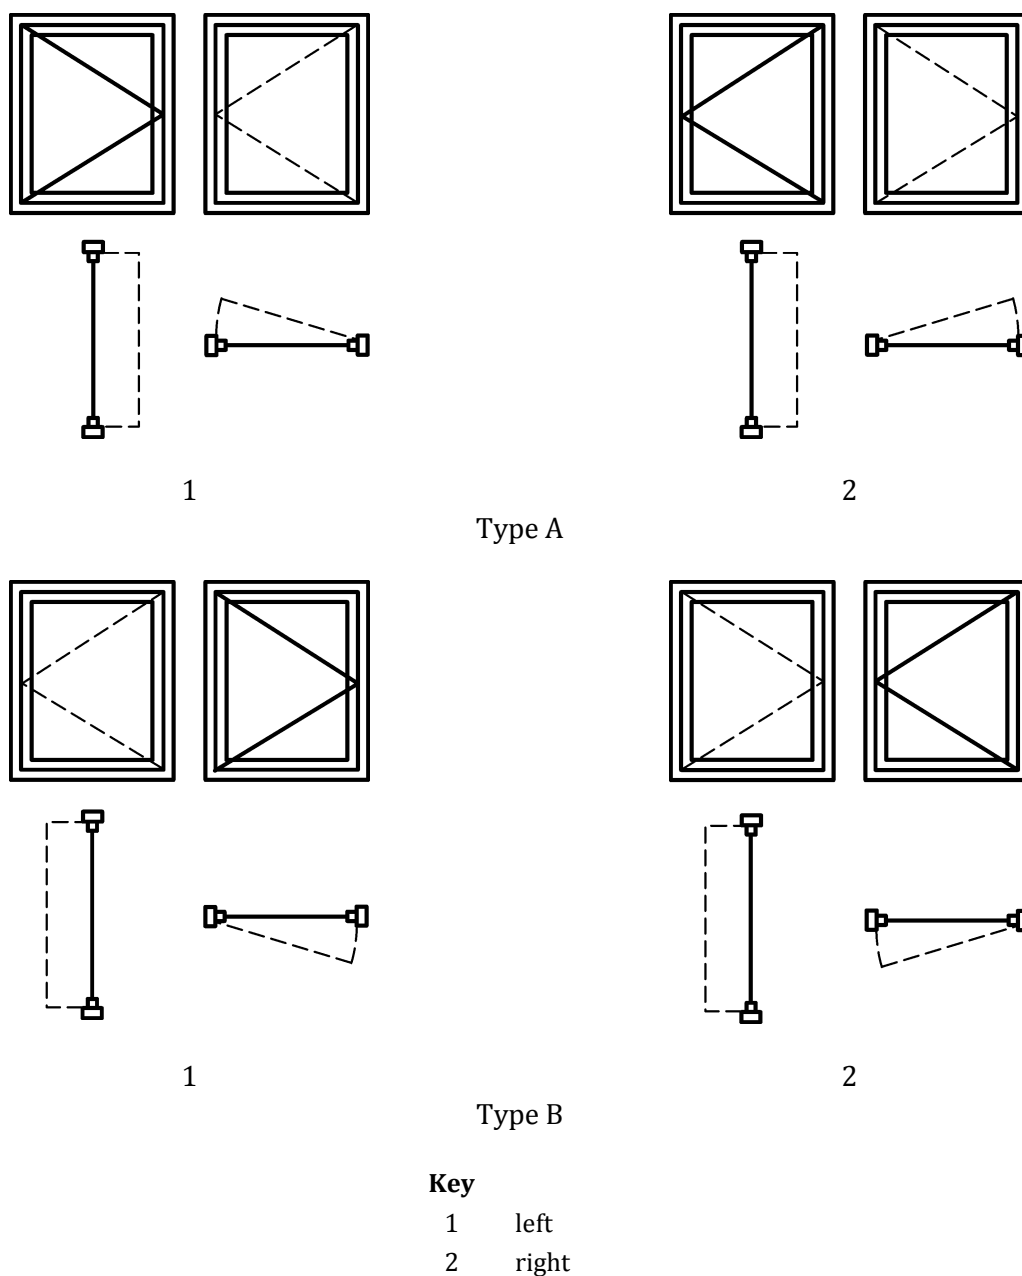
Type 'A' (inward opening) and type 'B' (outward opening) side-hung windows
